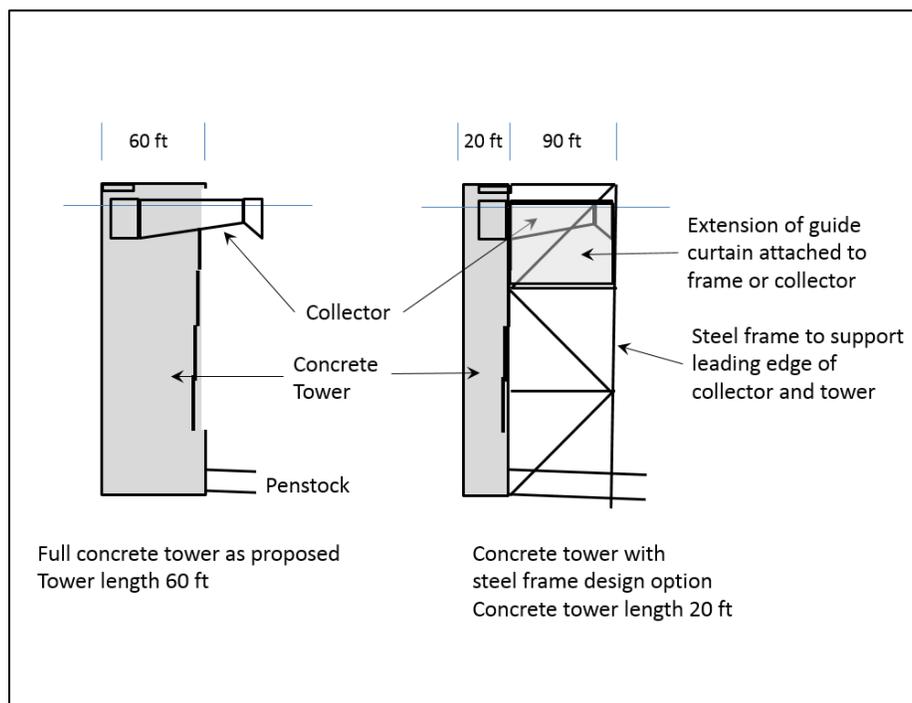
Schematic comparison of concrete tower and tower with steel frame support as could be applied for downstream Alternatives D3, D4 and D5.
